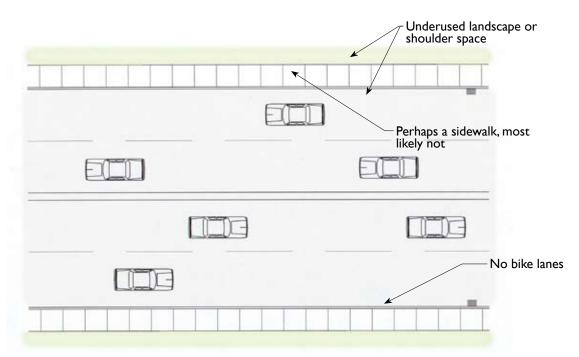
Conventional Highway/Arterial Street-Plan View
